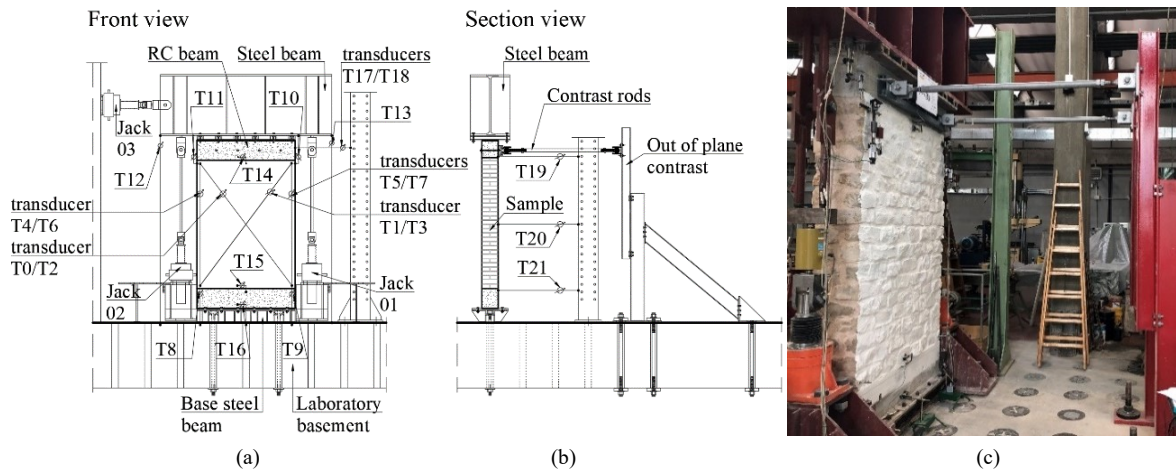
Shear compression test setup: a) front drawing of the test element, b) lateral drawing of the test element, c) view of the apparatus.
